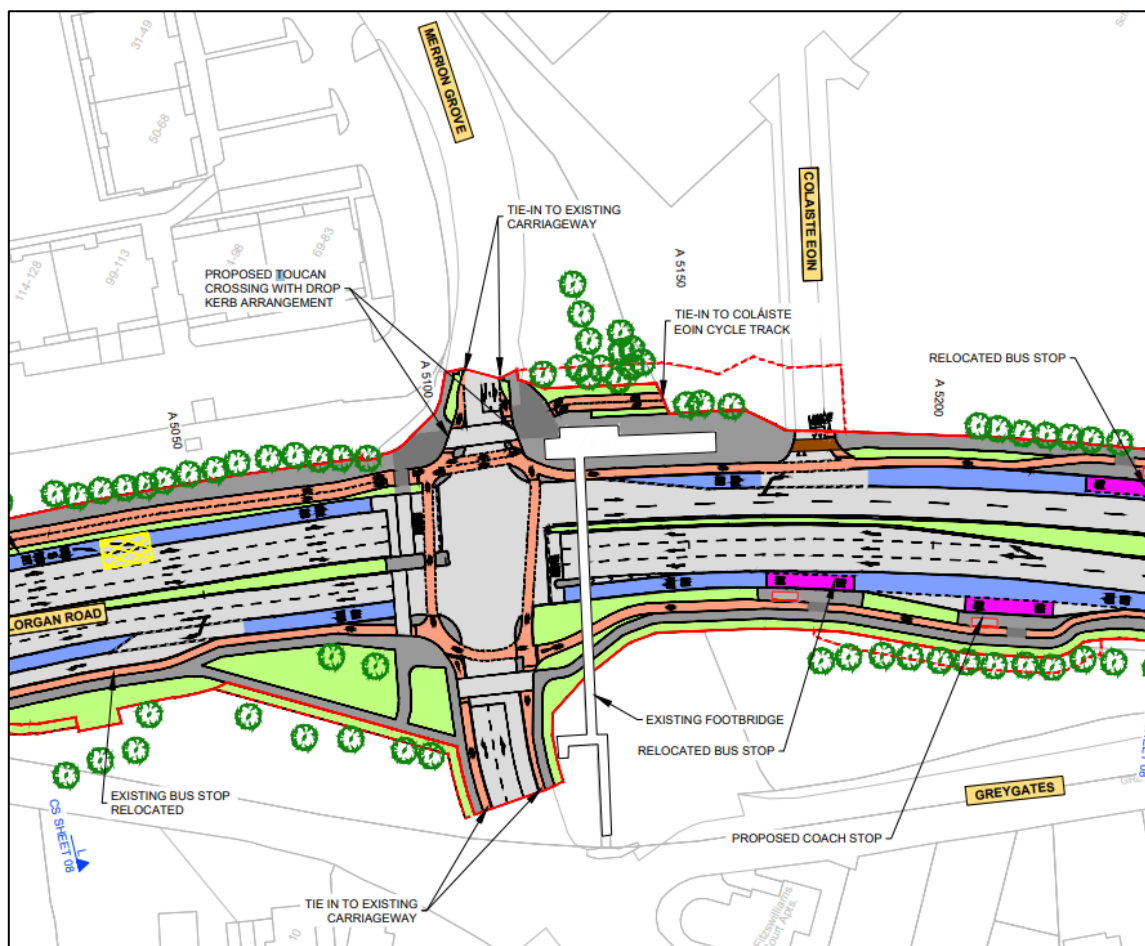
Extract from General Arrangement Drawings at Coláiste Eoin (Sheet 16)
